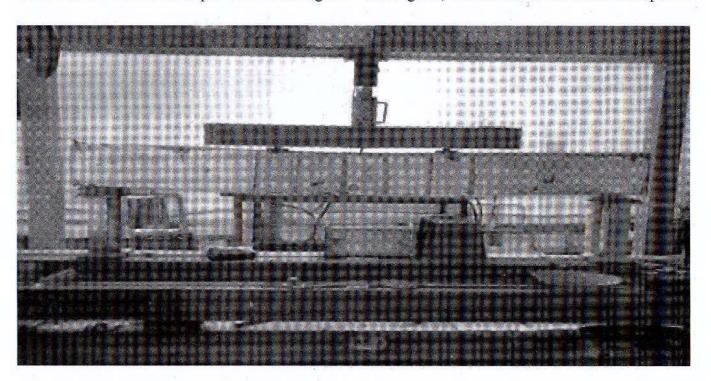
Coconut shell concrete beam testing on universal testing machine
